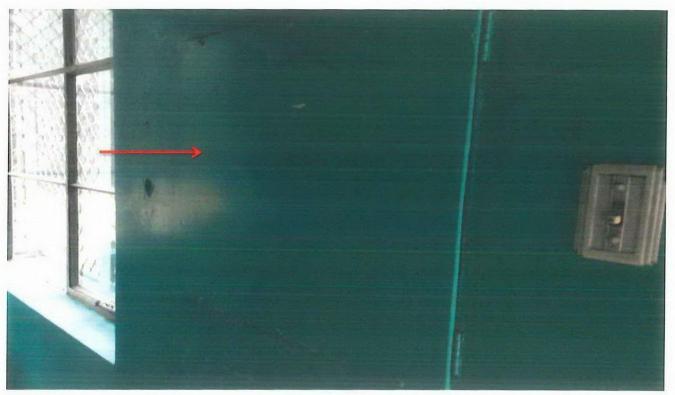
Asset D00151 – The Elise Langford Centre, Medlow Bath – asbestos cement sheet wall panel on the southern perimeter of the Main Room.
